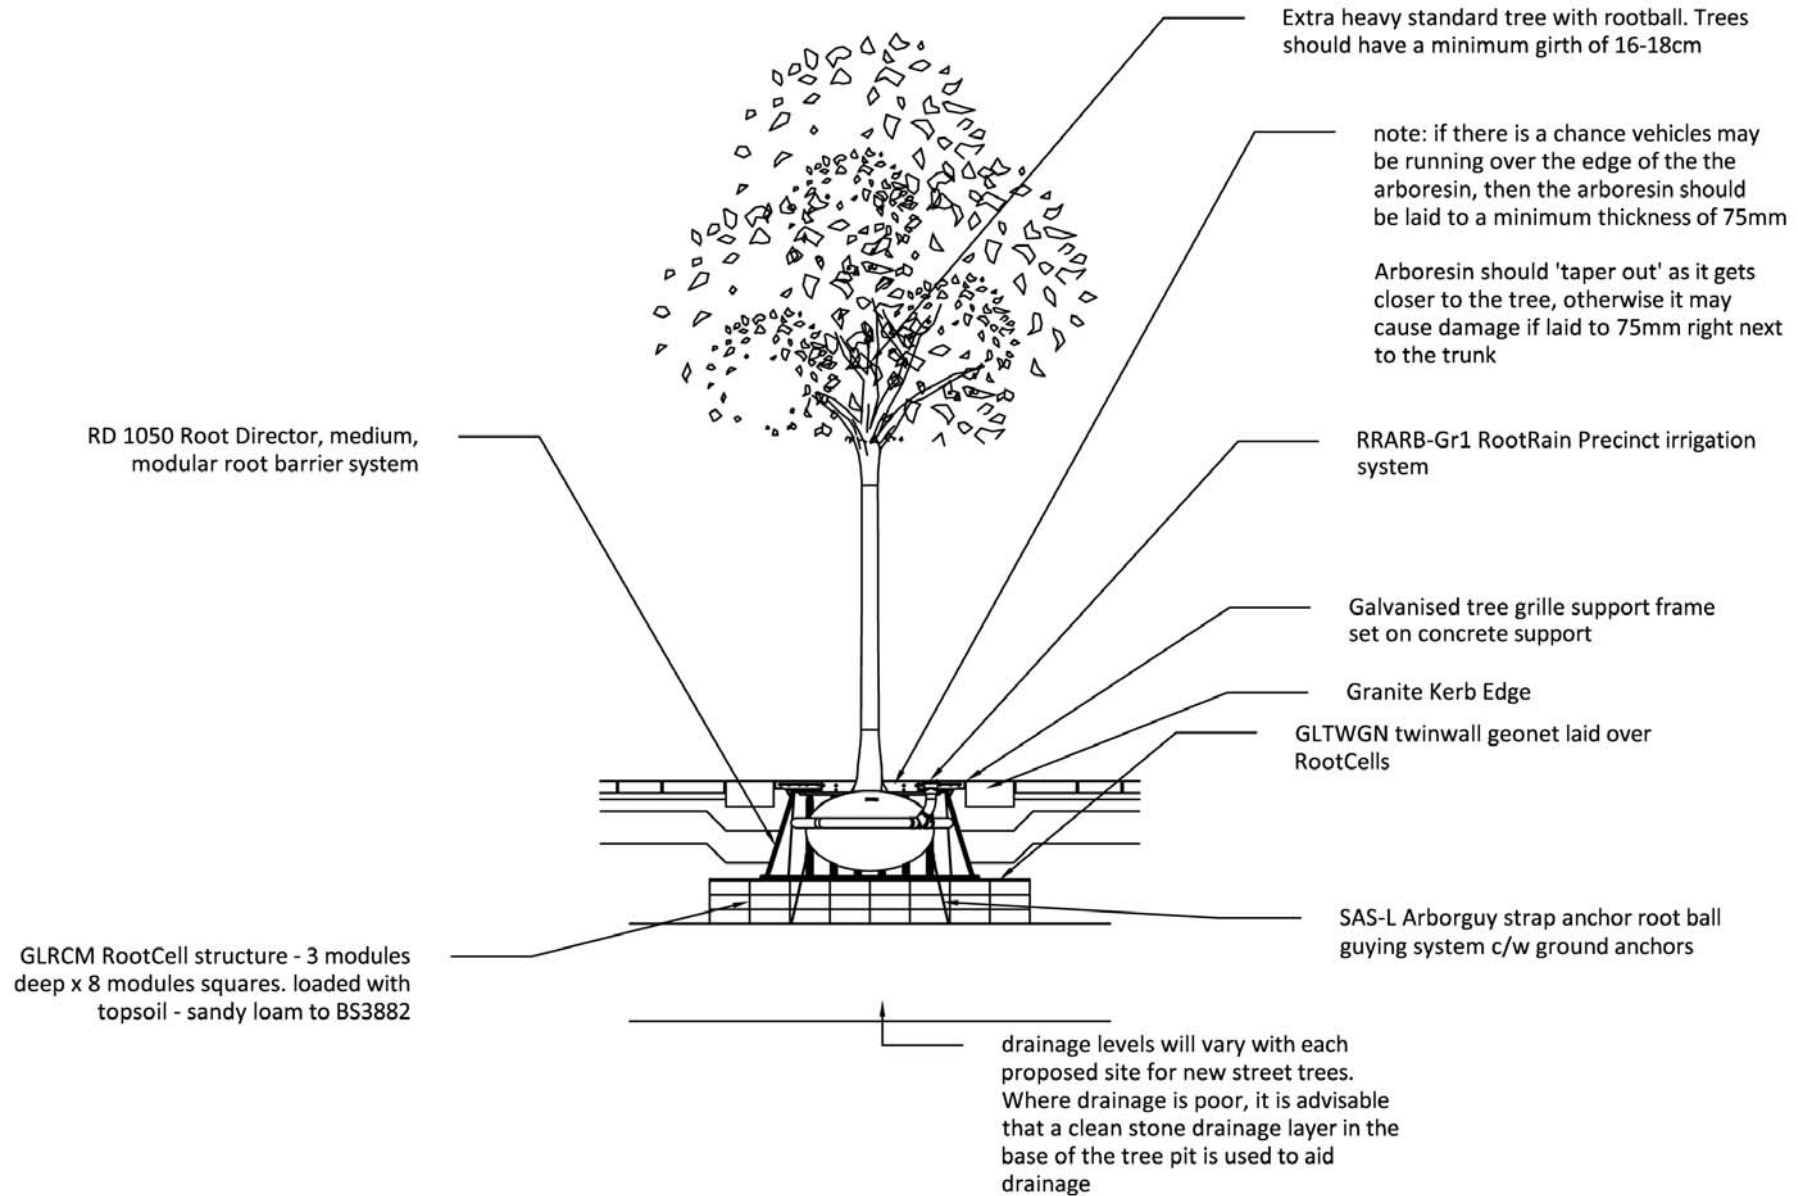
Tree pit detail with Greenleaf Clyde Grille (or equal approved)
